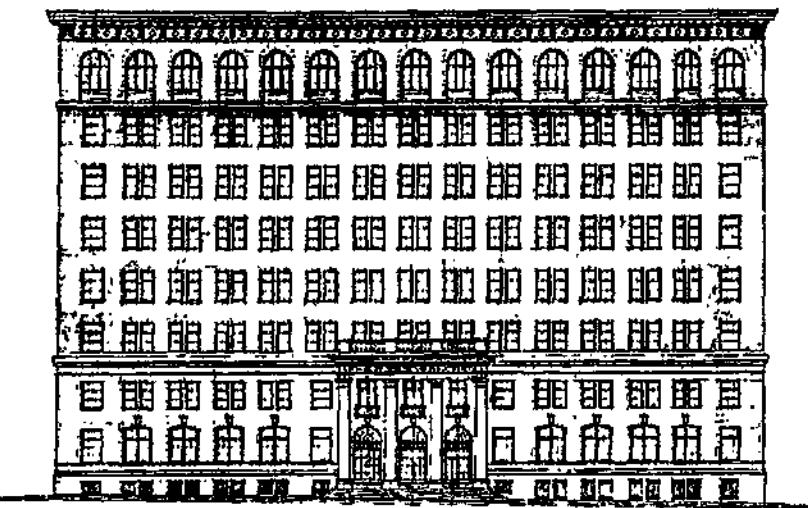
Architect's drawing of proposed new building to house the School of Hygiene and Public Health of Johns Hopkins University
